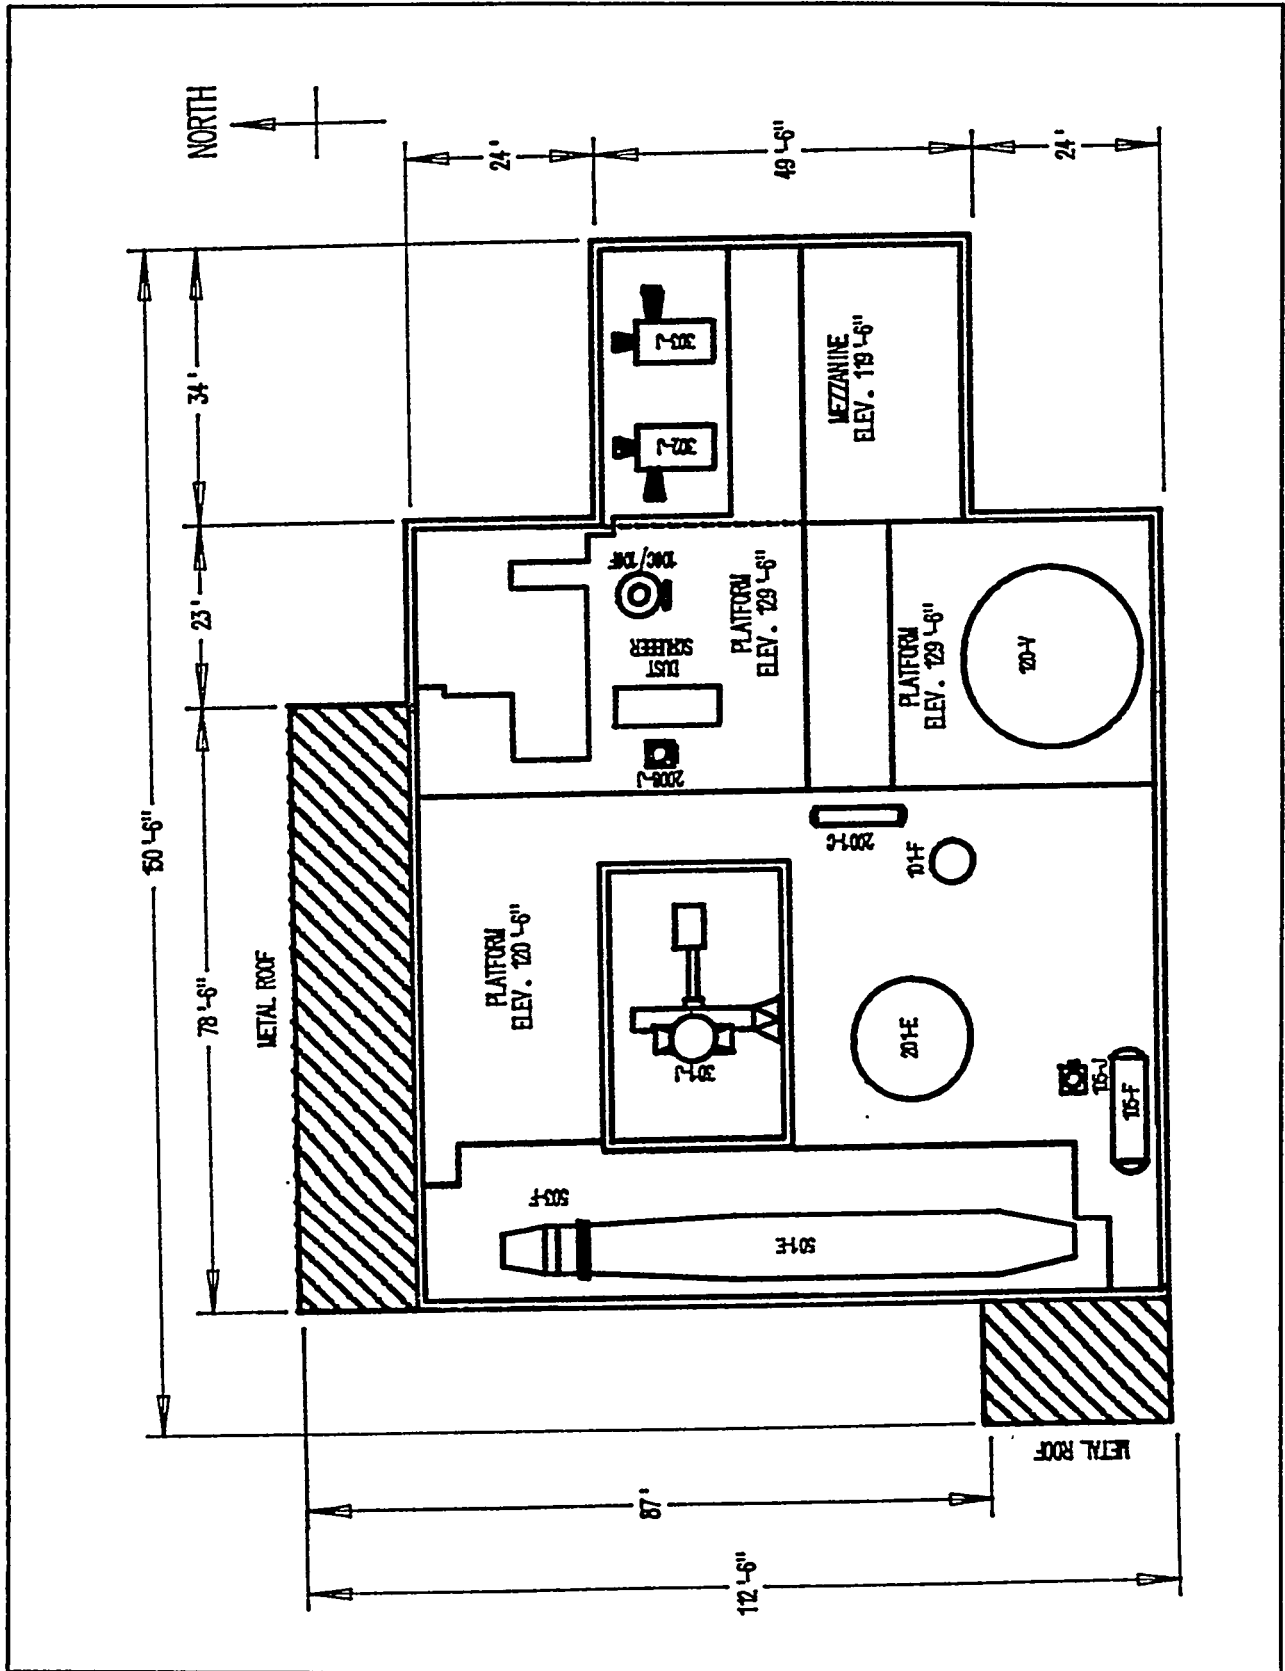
PDF Structure Floor Plan (Elevation 129'-6")
